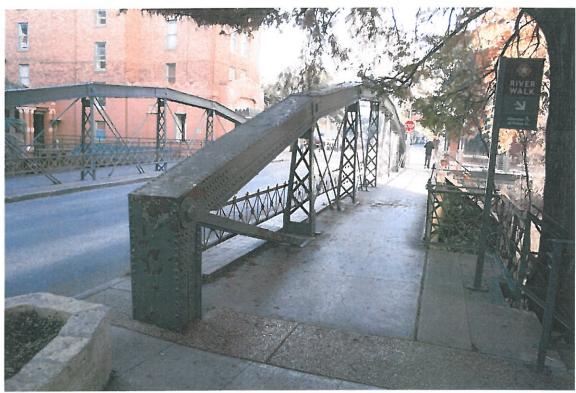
Northern Truss (Looking West toward N. Presa St.)
